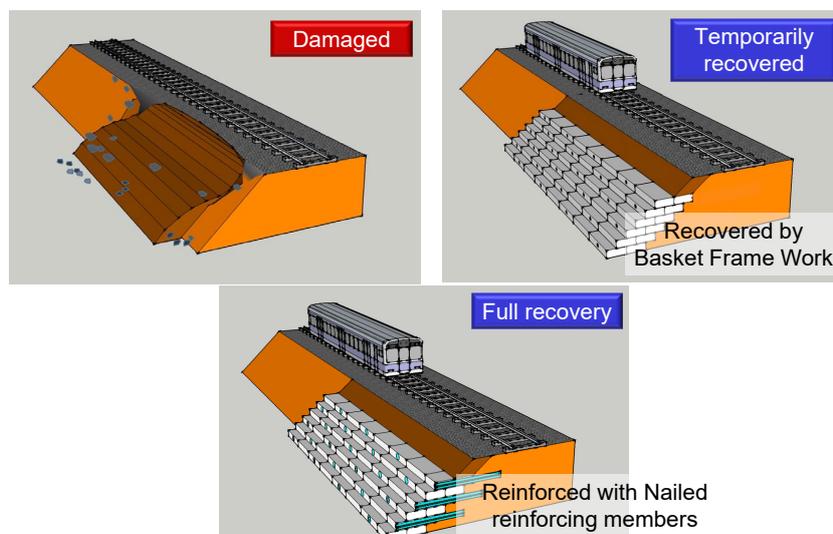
Example of step-by-step reinforced recovery of a damaged embankment
